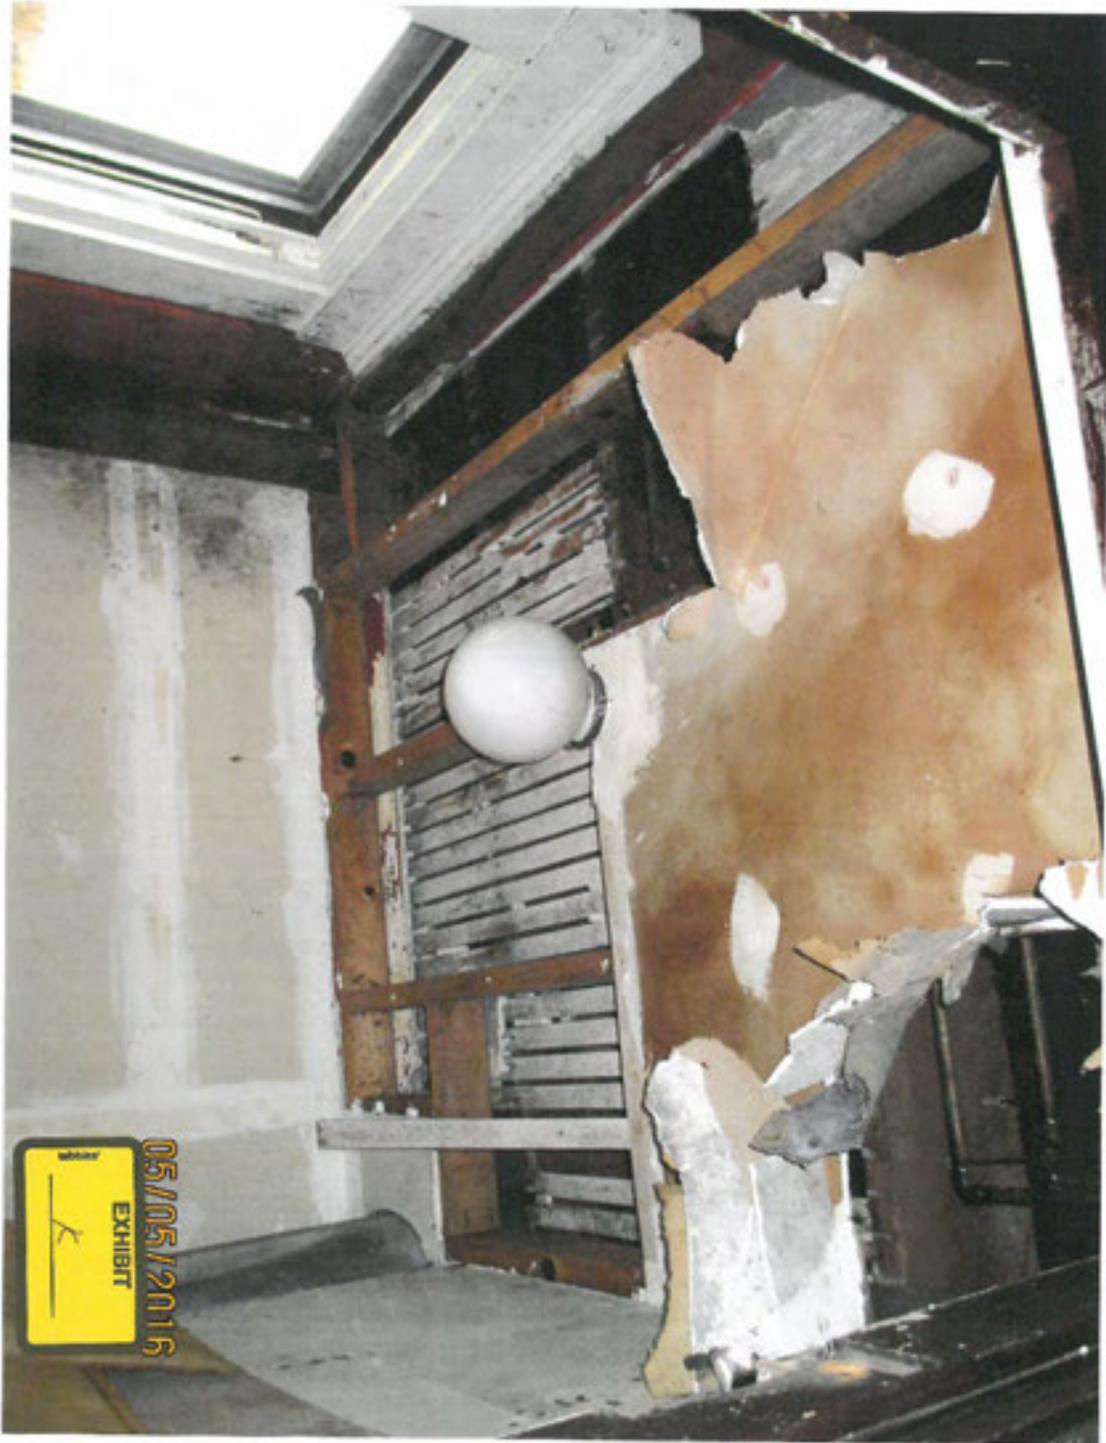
EXHIBIT L: Interior Photo depicting damage and neglect of fireplace
